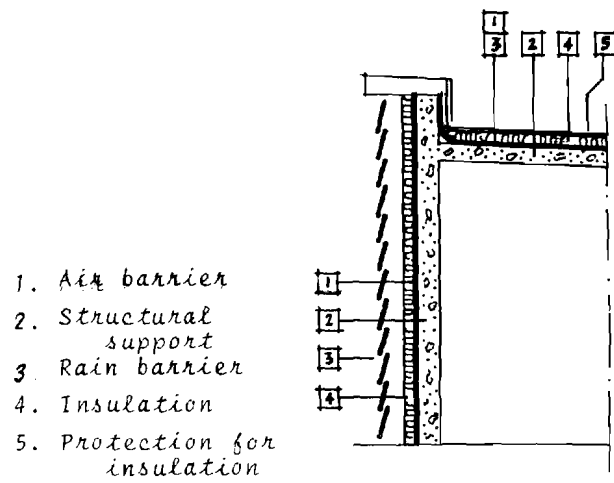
Drained, insulated, structurally supported air barrier on roof
